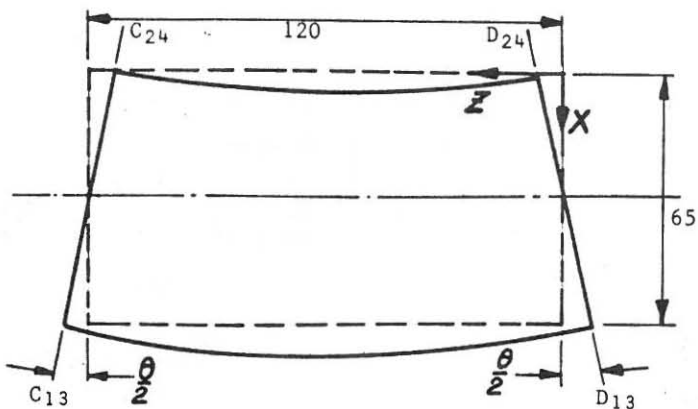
Plan View of Panel Module Showing Horizontal Bending
